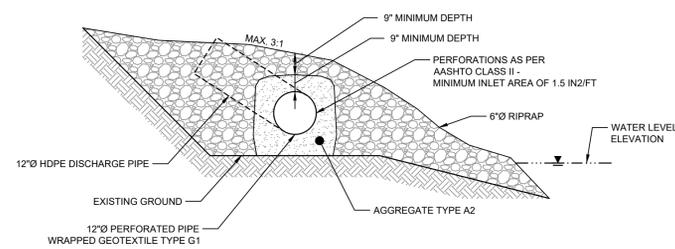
TEMPORARY PIPE CROSSING PROTECTION
